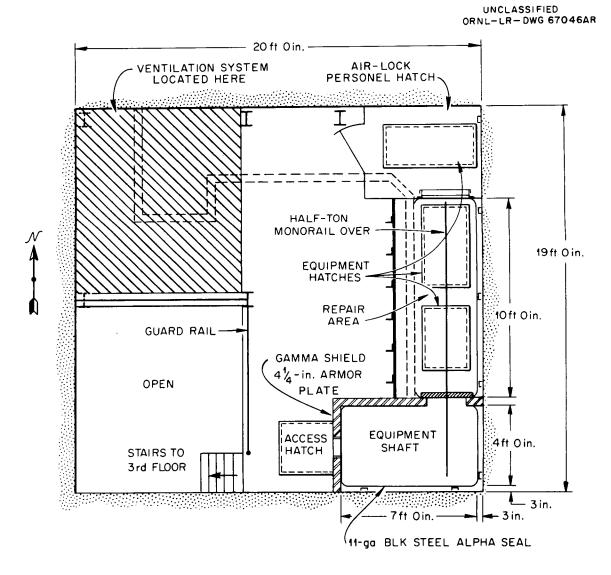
Second Floor Plan - Rod Fabrication Facility.
